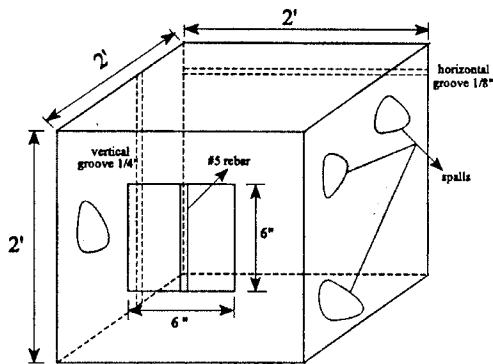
Concrete Test Block to Simulate Underwater Bridge Structure
